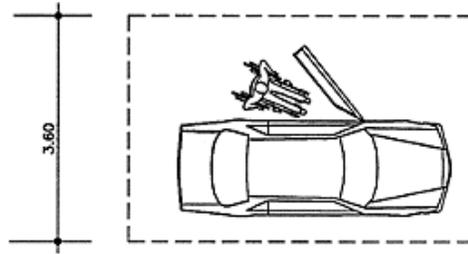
Parking width of 3.6 m instead of normal 2.5 m requirement
